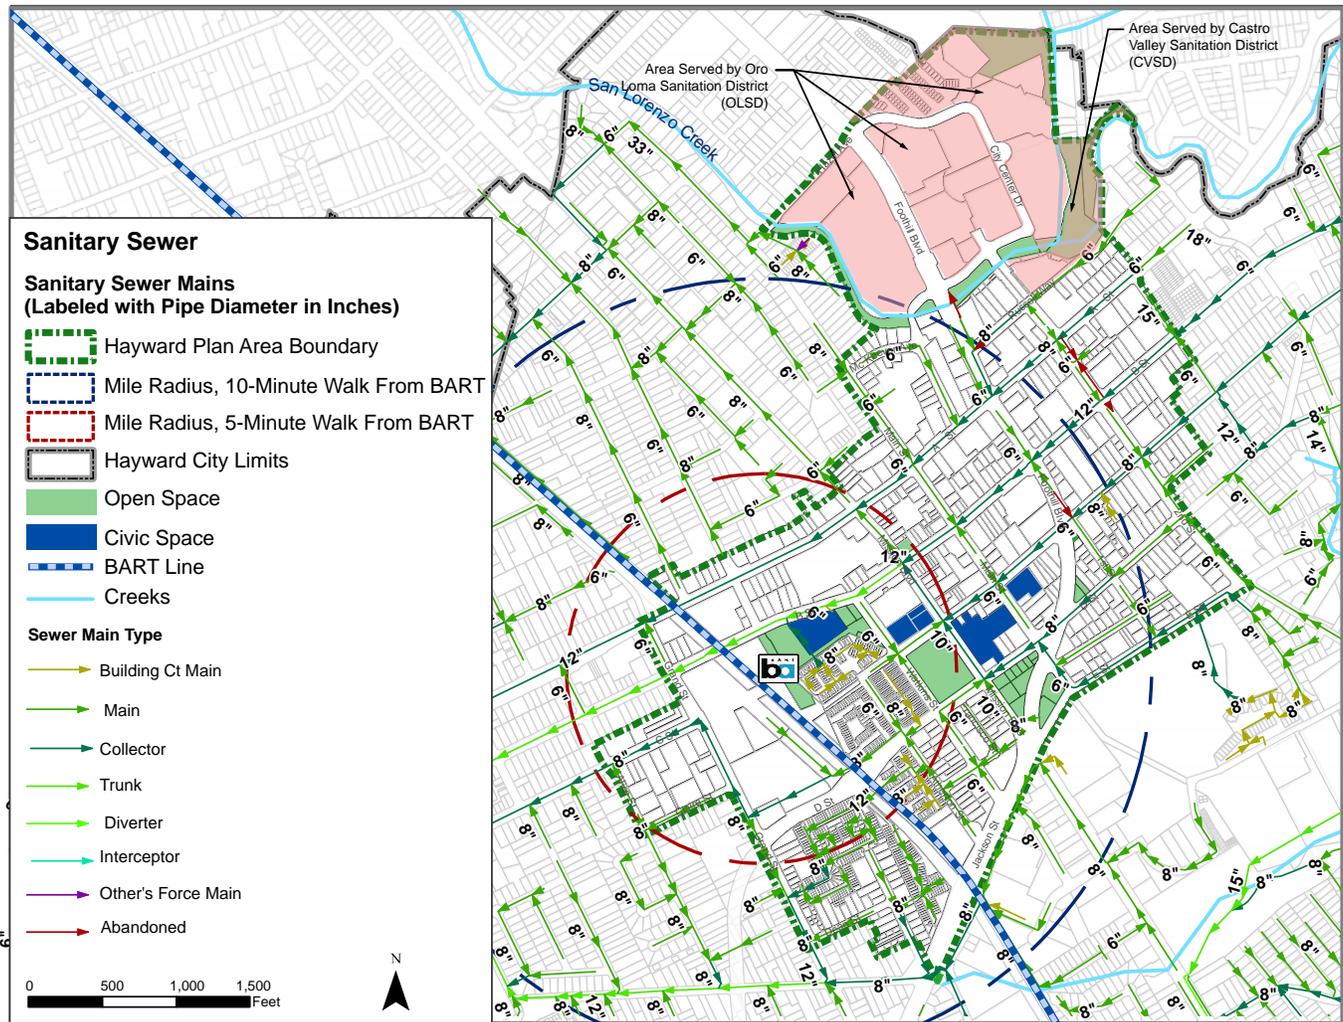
Sanitary Sewer Network within the Downtown Specific Plan Area
